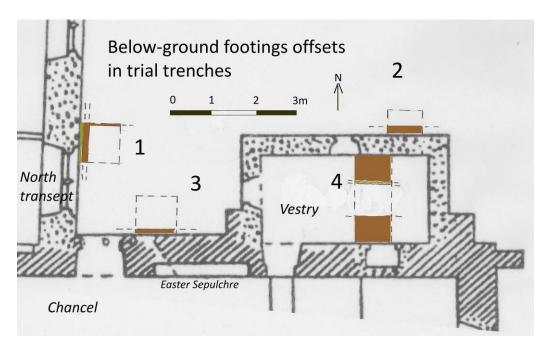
Plan of trial trenches on base plan from VCH 1912 showing excavated footings in brown
